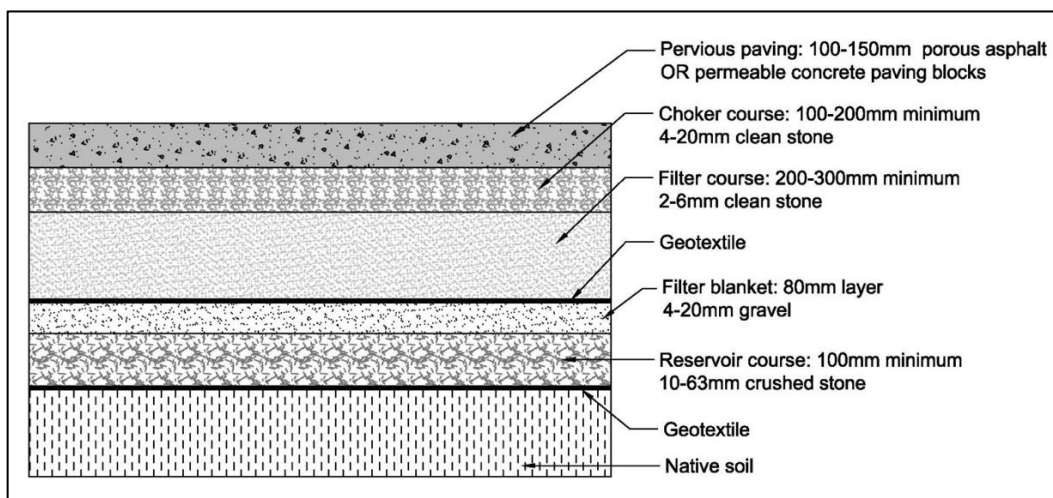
Cross section through typical permeable paving layers (after Novotny et al., 2010; Technicrete, n.d.)
